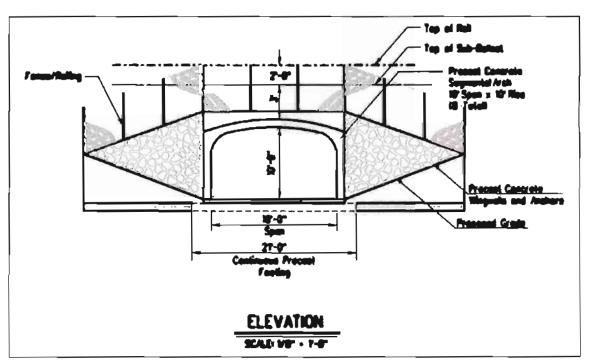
UPRR Precast Concrete Segmental Arch Cut and Cover Tunnel Elevation View (Typical)
